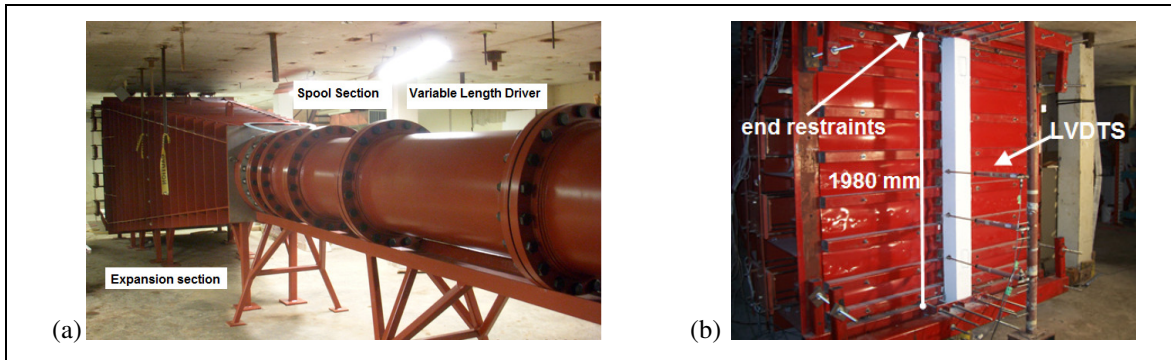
(a) University of Ottawa shock-tube and (b) column test setup.
